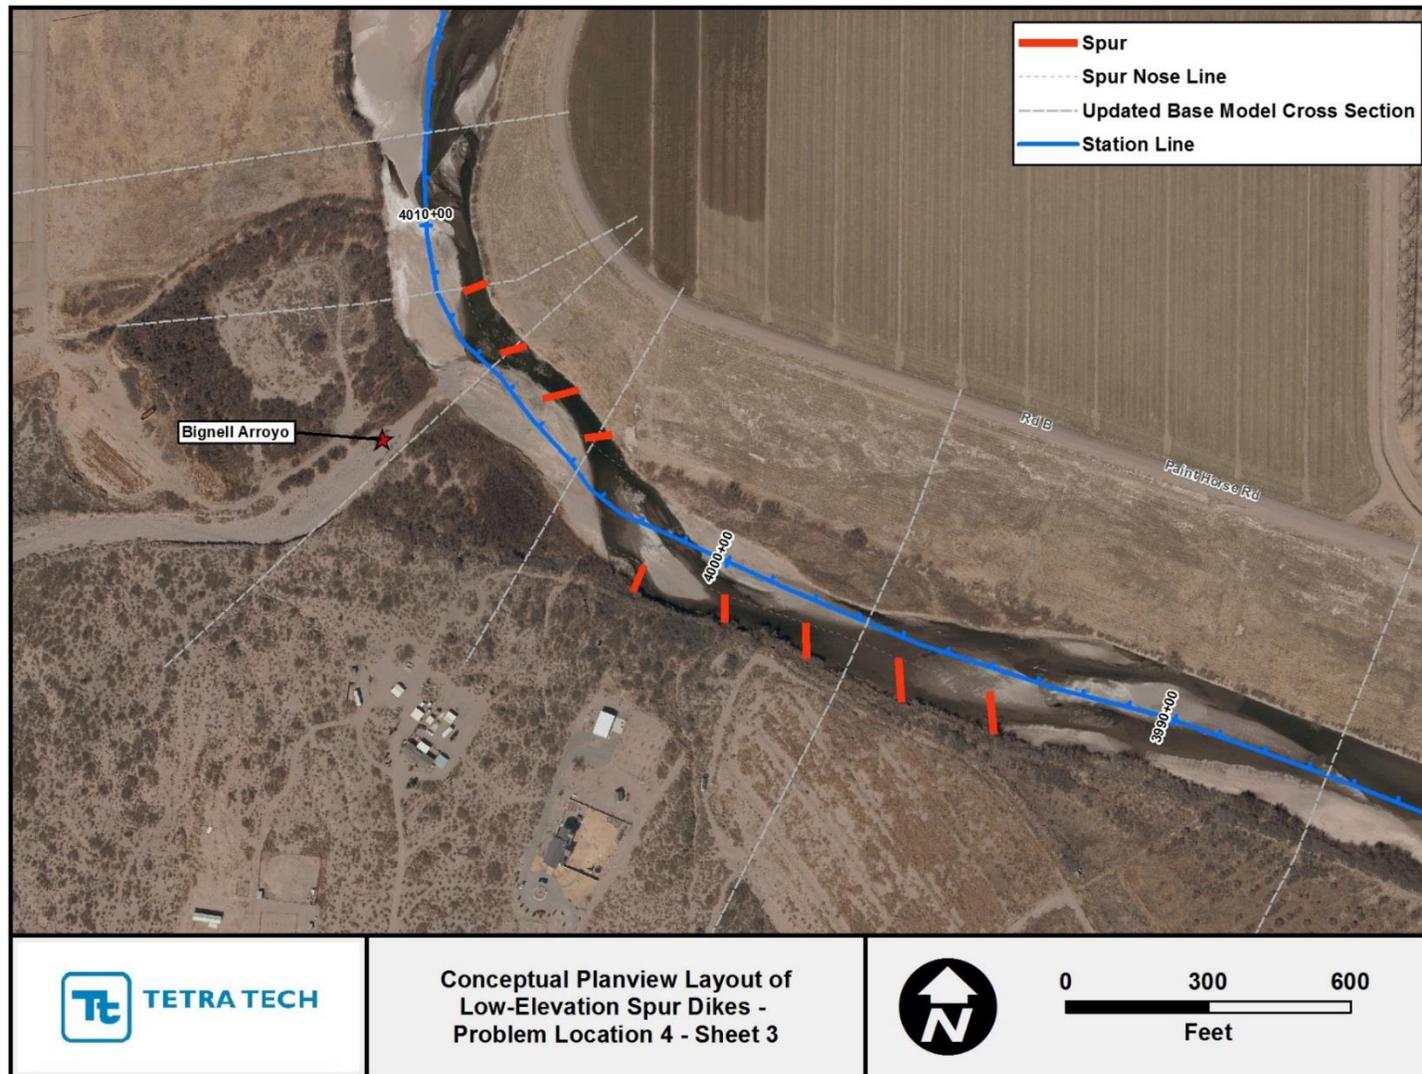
Conceptual layout of low-elevation spur dikes at Problem Location 4 (Sheet 3).
